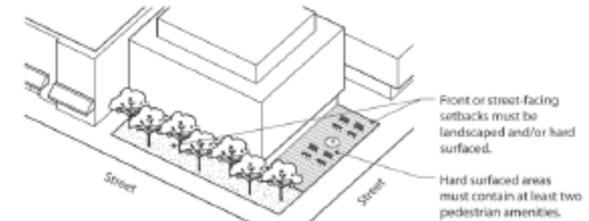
G: STREET-FACING SETBACKS
